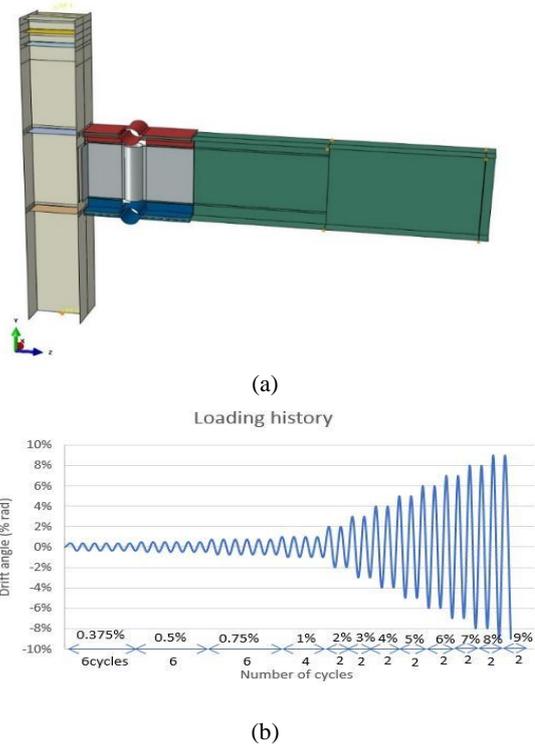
(a) 3D finite element modeling of HP-T connection, (b) Loading history
